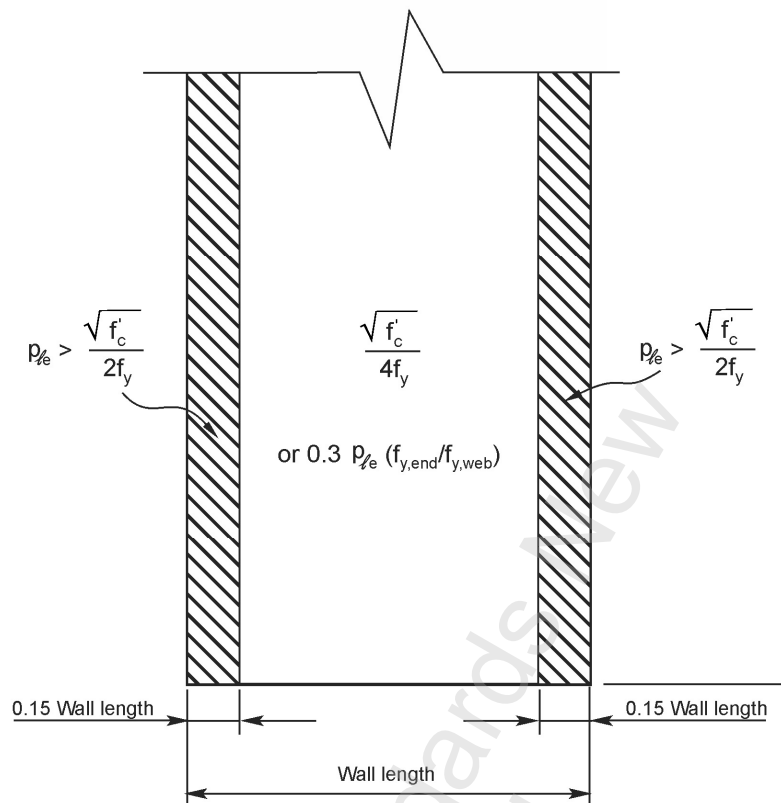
B – Wall elevation – minimum reinforcement requirements
